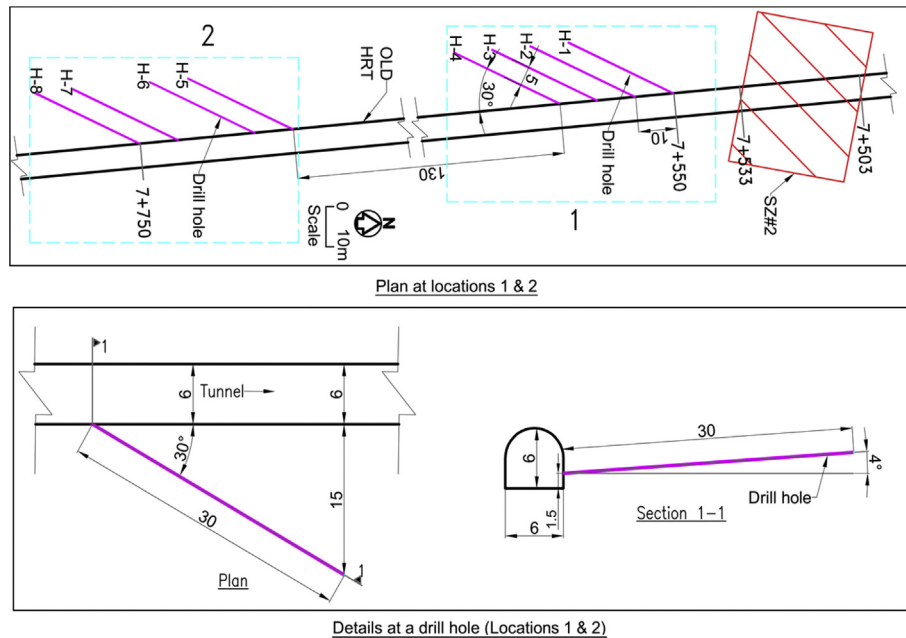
Location plan details at locations 1 and 2 (all dimensions are in m).
